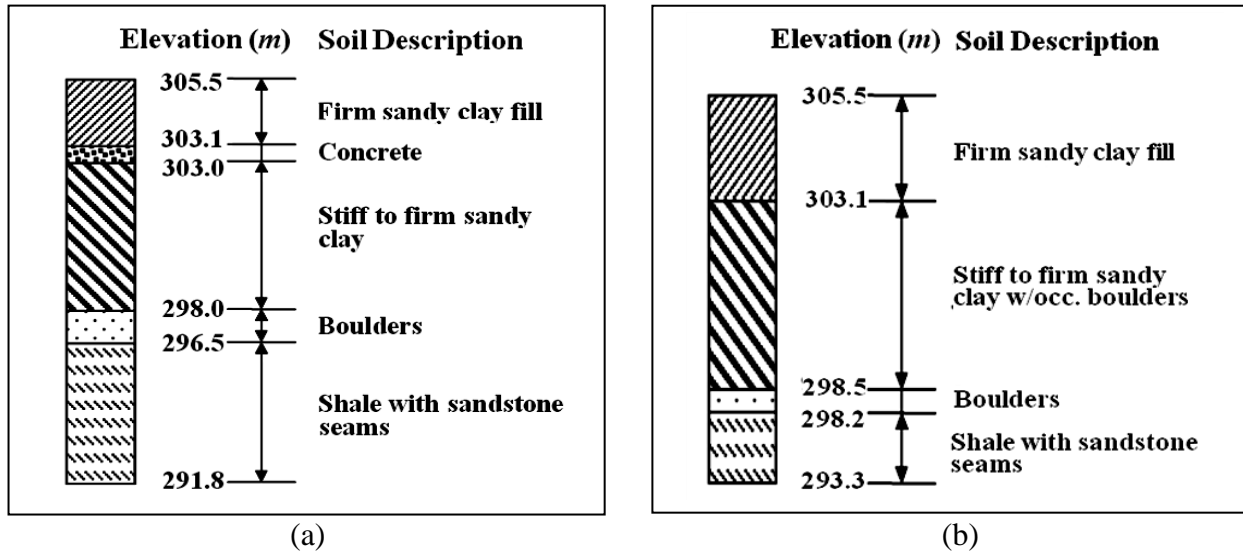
Soil borings at the bridge (a) Near the south abutment; and (b) Near the north abutment [1].
